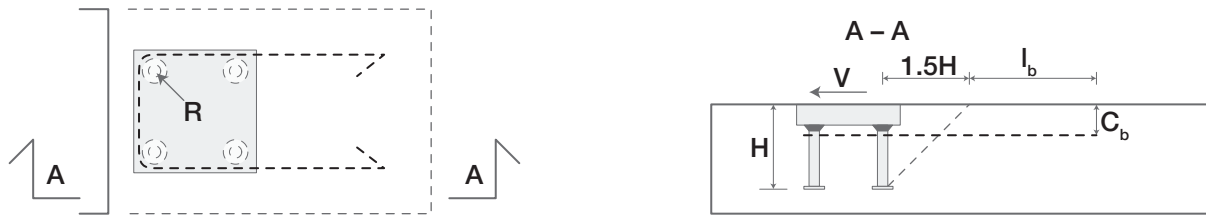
ADDITIONAL REINFORCEMENT OF EFP, EHD FASTENING PLATE FOR SHEAR FORCE AND TORSIONAL MOMENT
